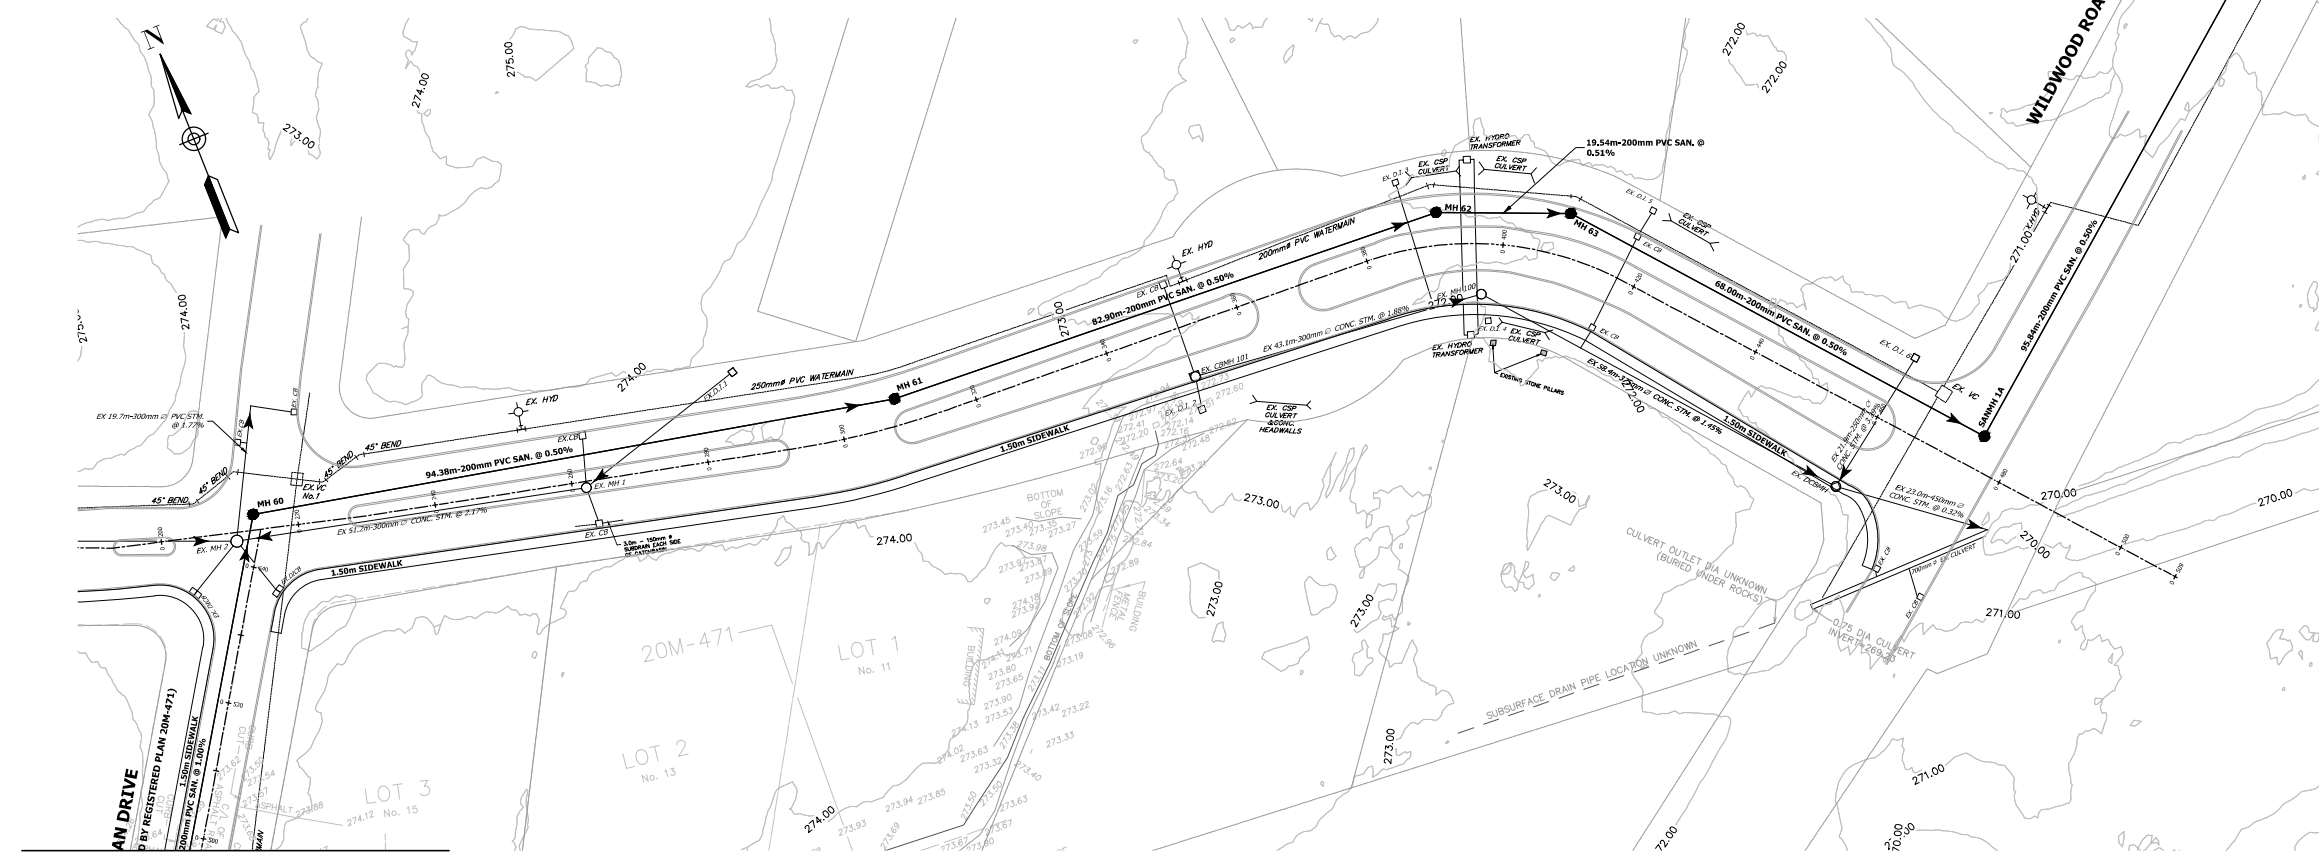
EXTERNAL SANITARY SEWER PLAN AND PROFILE
